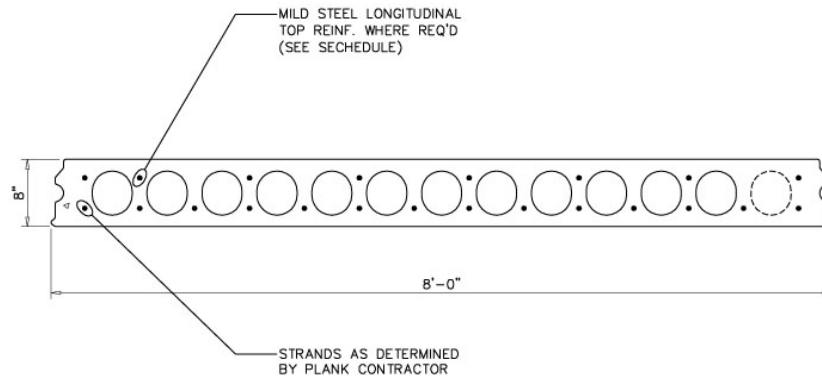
Section of a typical 8" Hollow Core Concrete Plank
